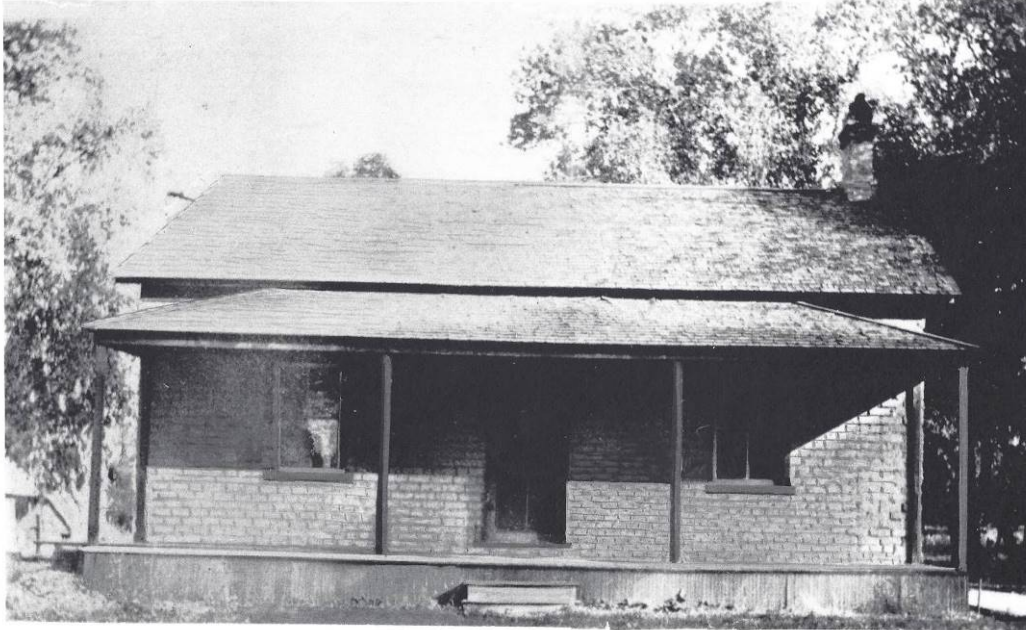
Undated photograph of southeast façade prior to 1930s remodel. This photograph was published in the Salt Lake Tribune Newspaper (Utah), February 18, 1945. Note the damage to the adobe bricks and cobblestone foundation visible on the east façade.
